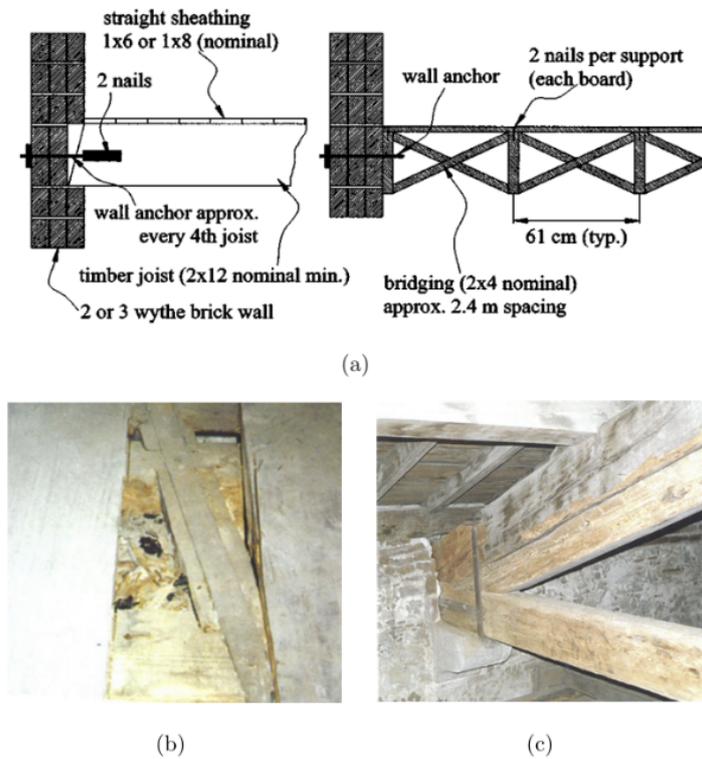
Metal anchorages between timber beams and masonry wall: (a) connections between the parallel or perpendicular joist and the wall; (b) diagonal bar embedded into the transversal joists; (c) roof-to-wall connection
